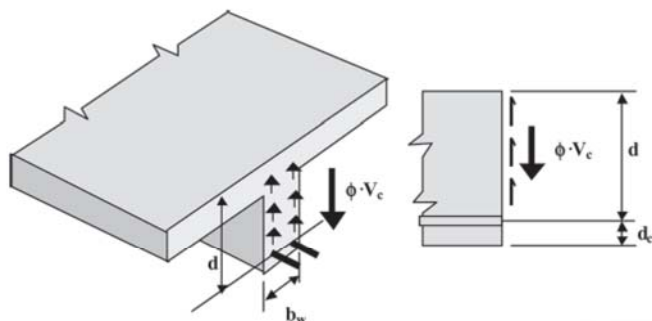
Contribution of concrete to beam-action shear strength in girders, beams, and joists.
